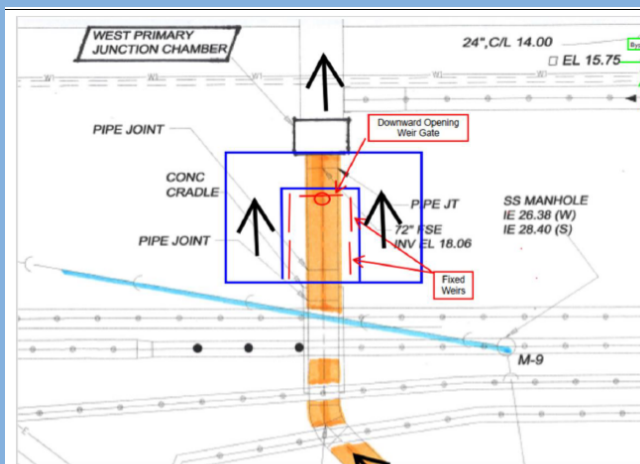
Proposed Layout-Alternative E (West Plant Splitter Structure)
